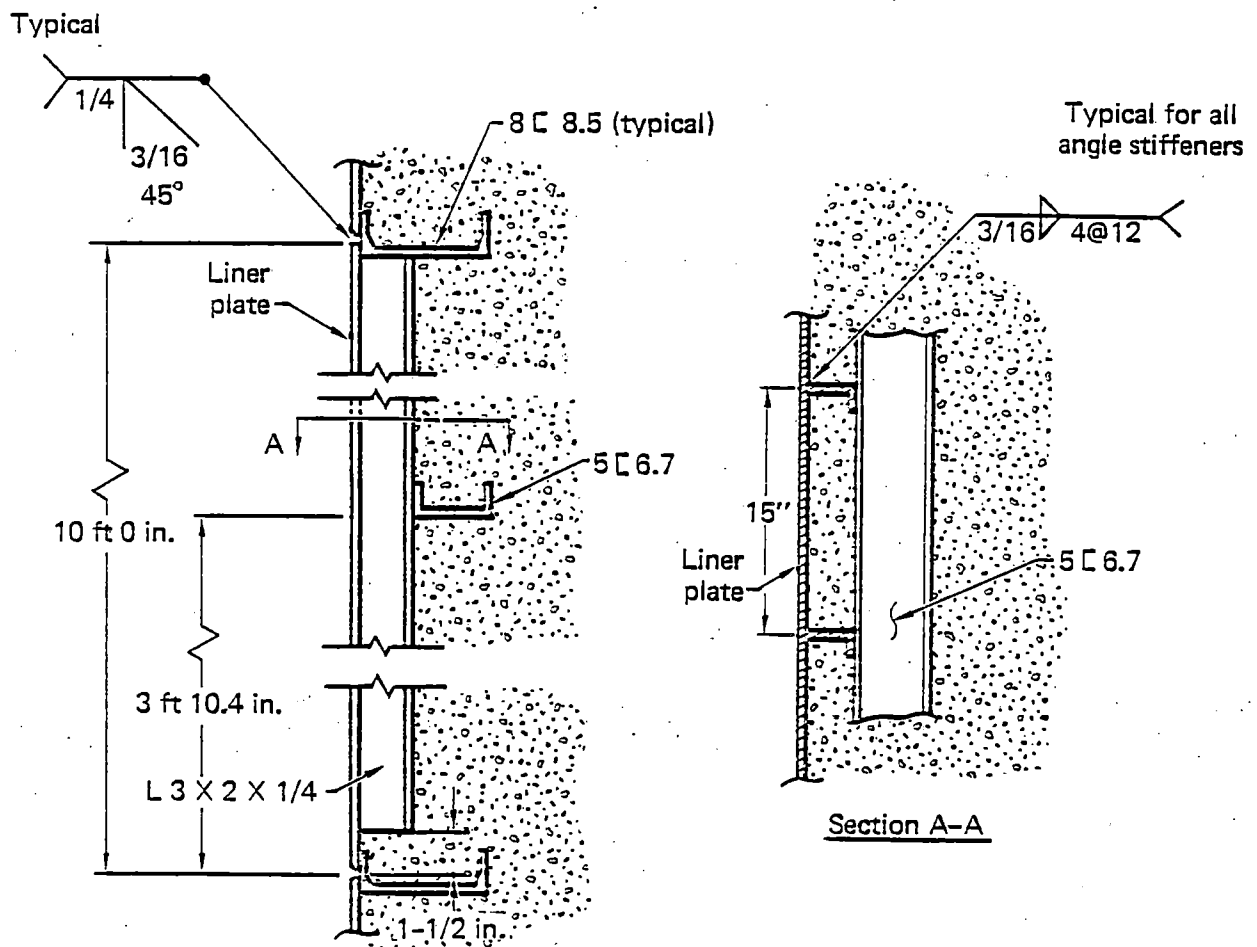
Typical liner anchor details in the cylindrical portion of the containment.
